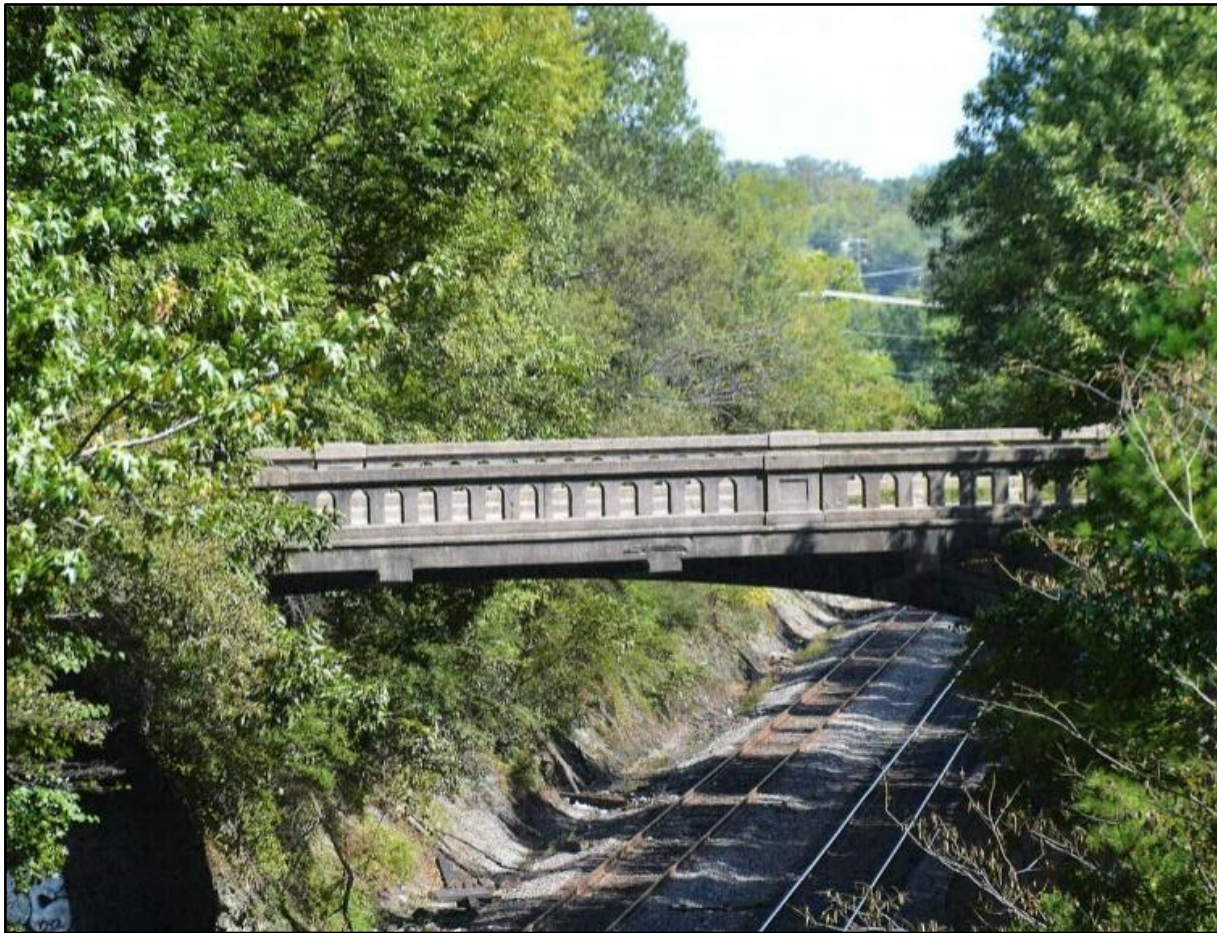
W. 12th Overpass looking north over the railroad tracks.
